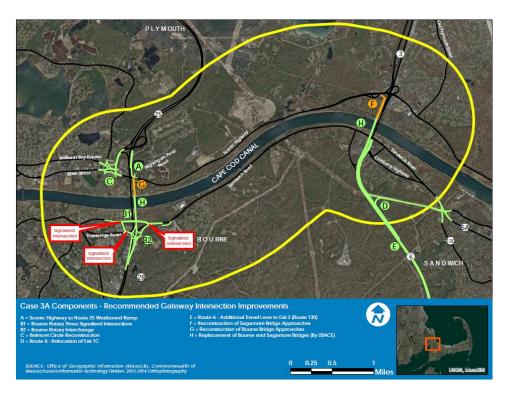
MassDOT Canal Study Gateway Intersection Improvement Overview²⁹
